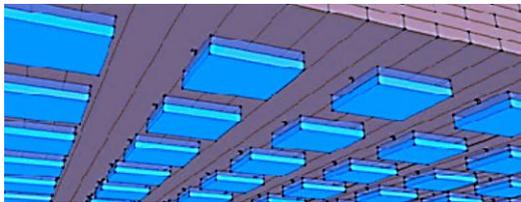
DMD array on undersides of CLT floor slab (adapted from Weckendorf and Smith)
